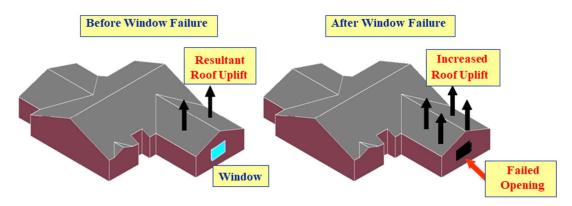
Protection of Wall Envelope Reduces Likelihood of Internal Pressurization.
